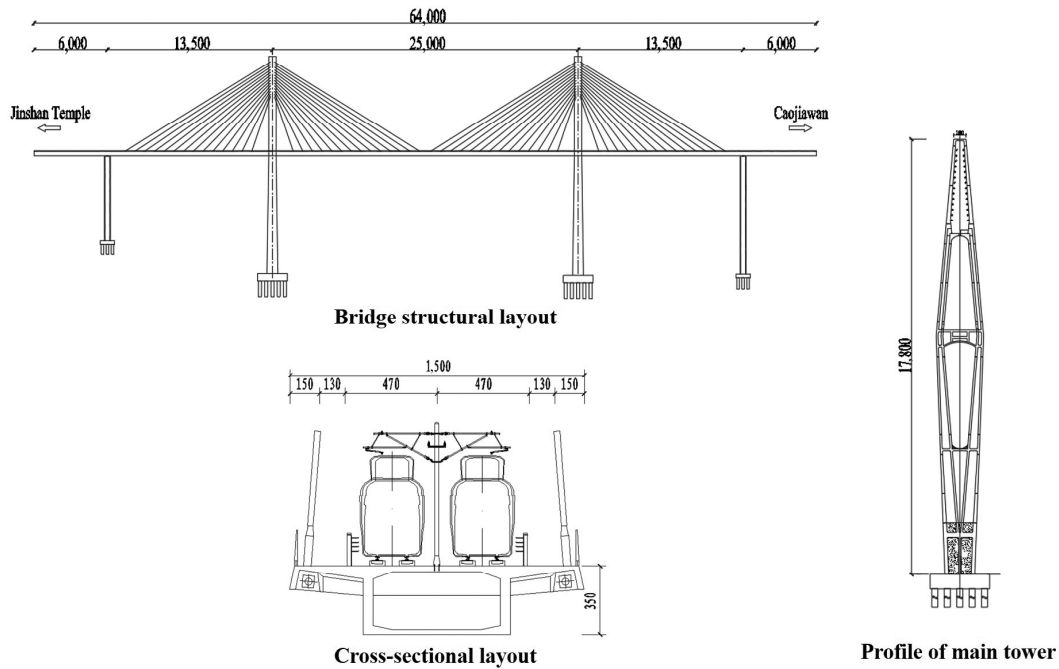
Caijia Jialing River Bridge layout (unit: cm).
